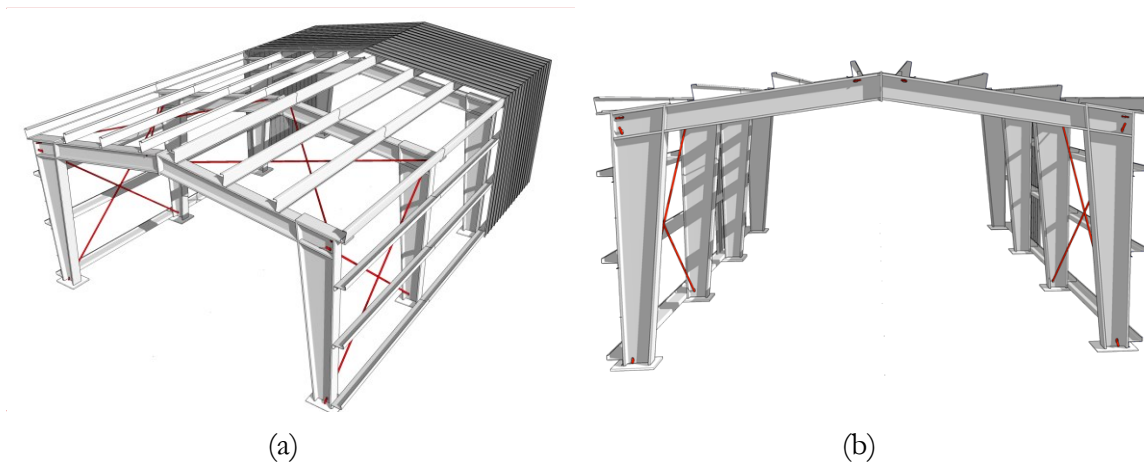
Typical Metal Building System: (a) Three-dimensional view; (b) Front view
